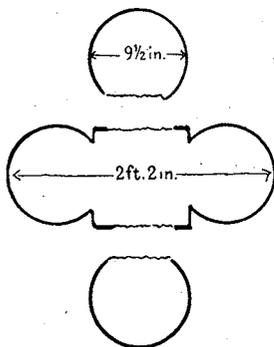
Drums of the pier of the earlier chapel now built into the east wall.
